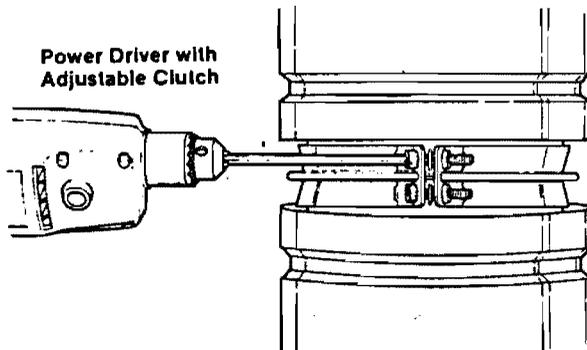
Basic Assembly Step 4: Tighten Containment Band fasteners using alternating pattern.
